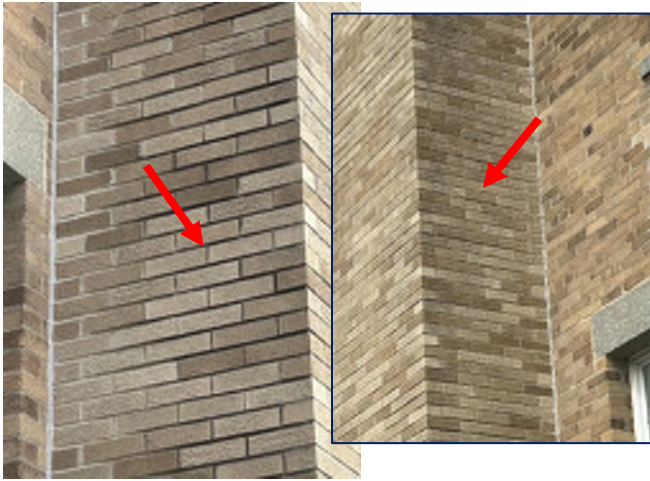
Views of textured brick masonry units on the chimney on the south elevation of the building.
